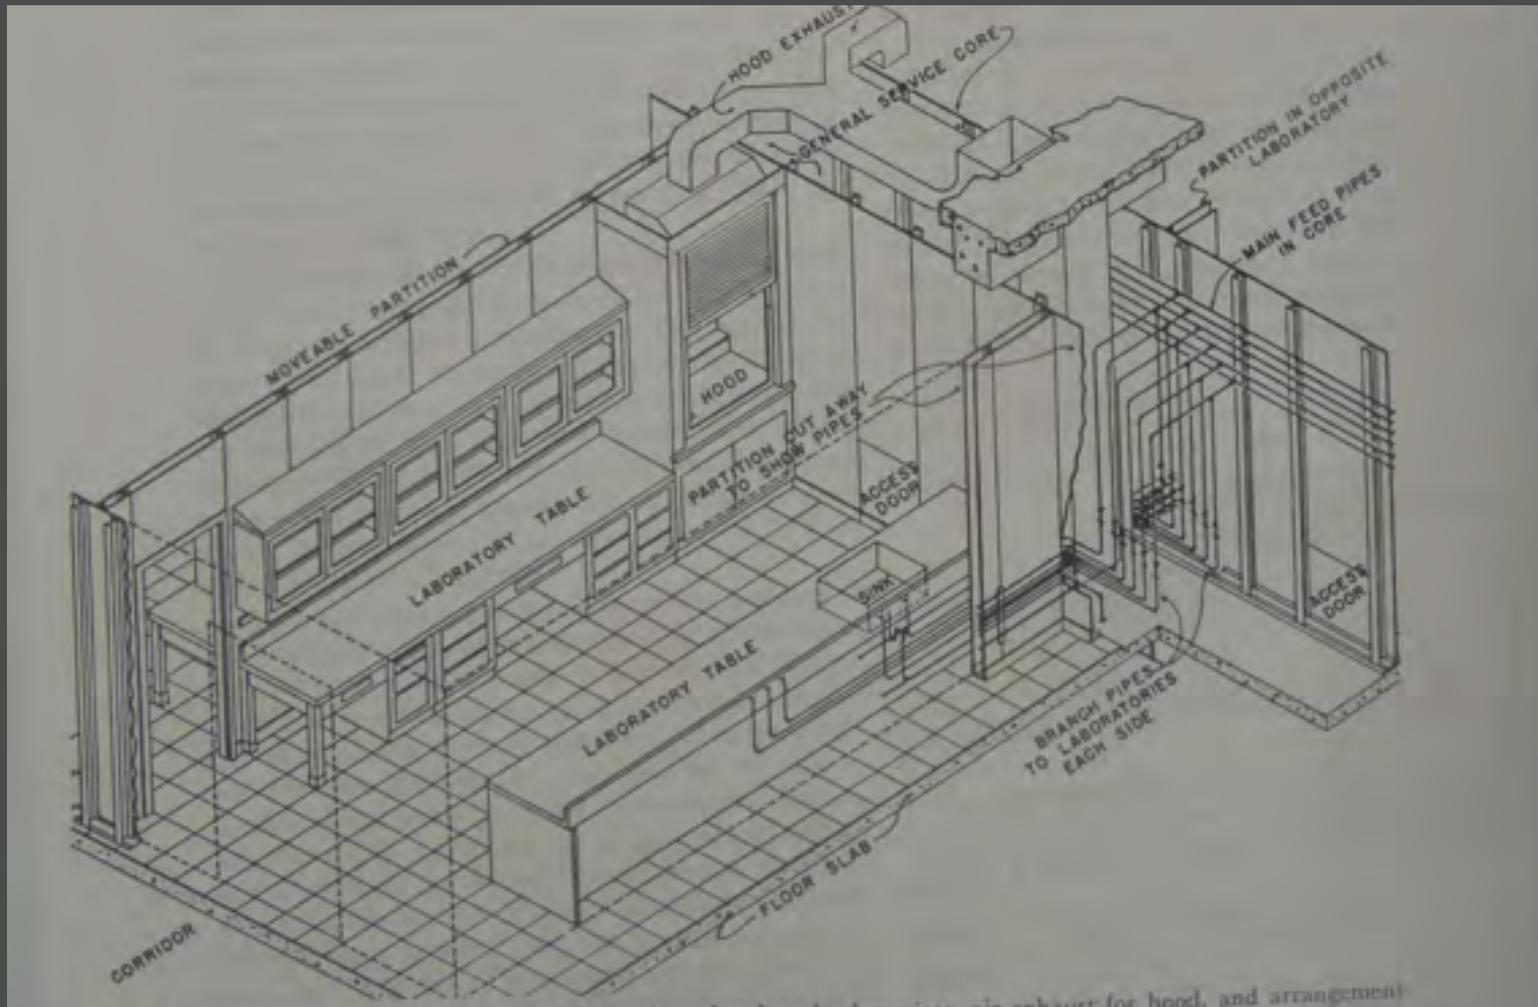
Isometric drawing of typical module, showing plan for piped services, air exhaust for hood, and arrangement of furniture.
